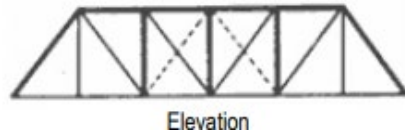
PRATT TRUSS (DIAGONAL) BRIDGE.
